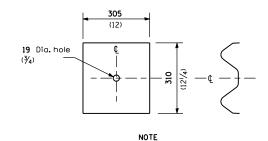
Plate A shall be placed between rail element and block-out at nonsplice mounting points only when steel block-outs are used.
